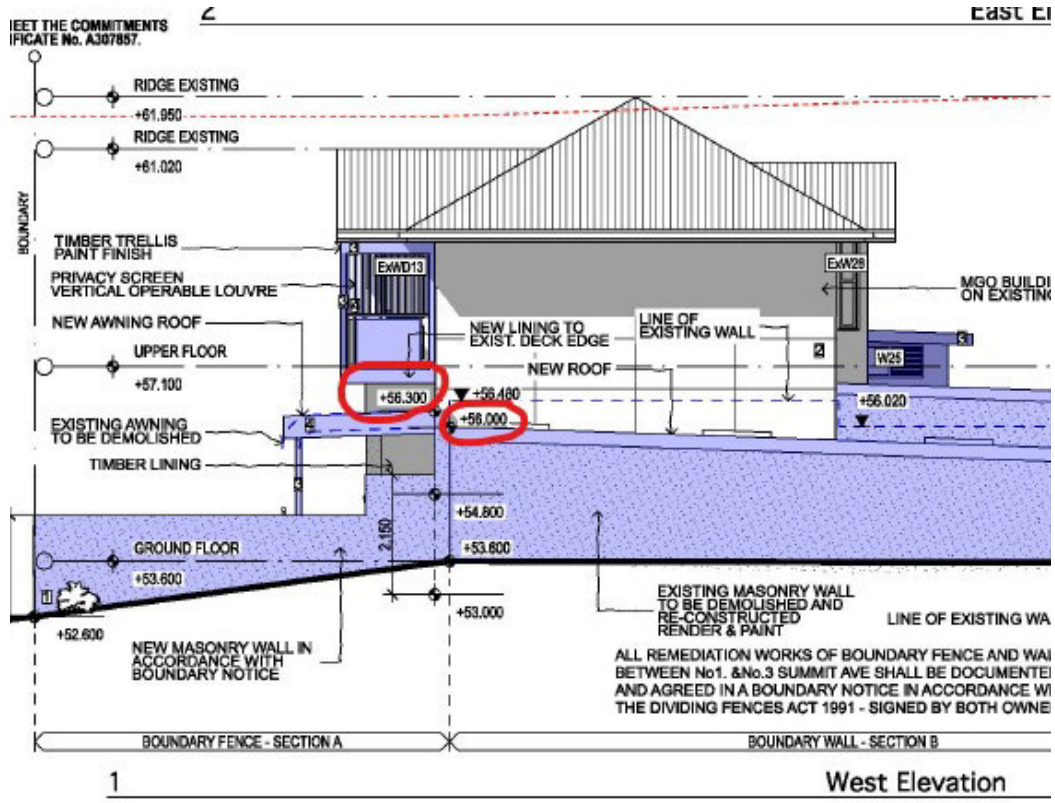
The Consent plans show the existing deck at RL 56.300 on the western elevation. This is a height of 300mm above the Boundary Wall, which is shown at RL 56.000.
